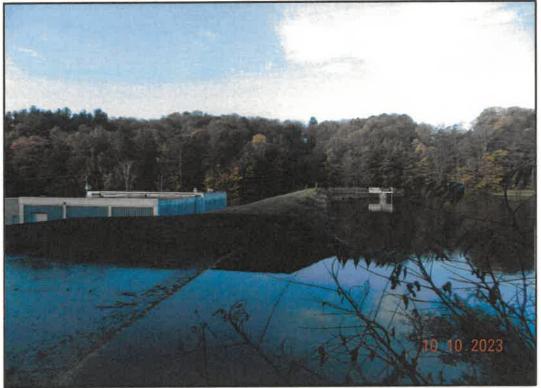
Spillway Entrance and Upstream Embankment looking Southwest
